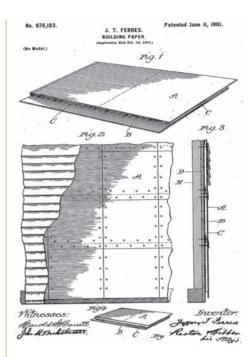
J.T. Ferres's building paper patent No. 676,183, 1901. A and B refer to facing sheets, C to intermediate corrugated sheet, D to sheathing, and E to joist. US Patent and Trademark Office.
